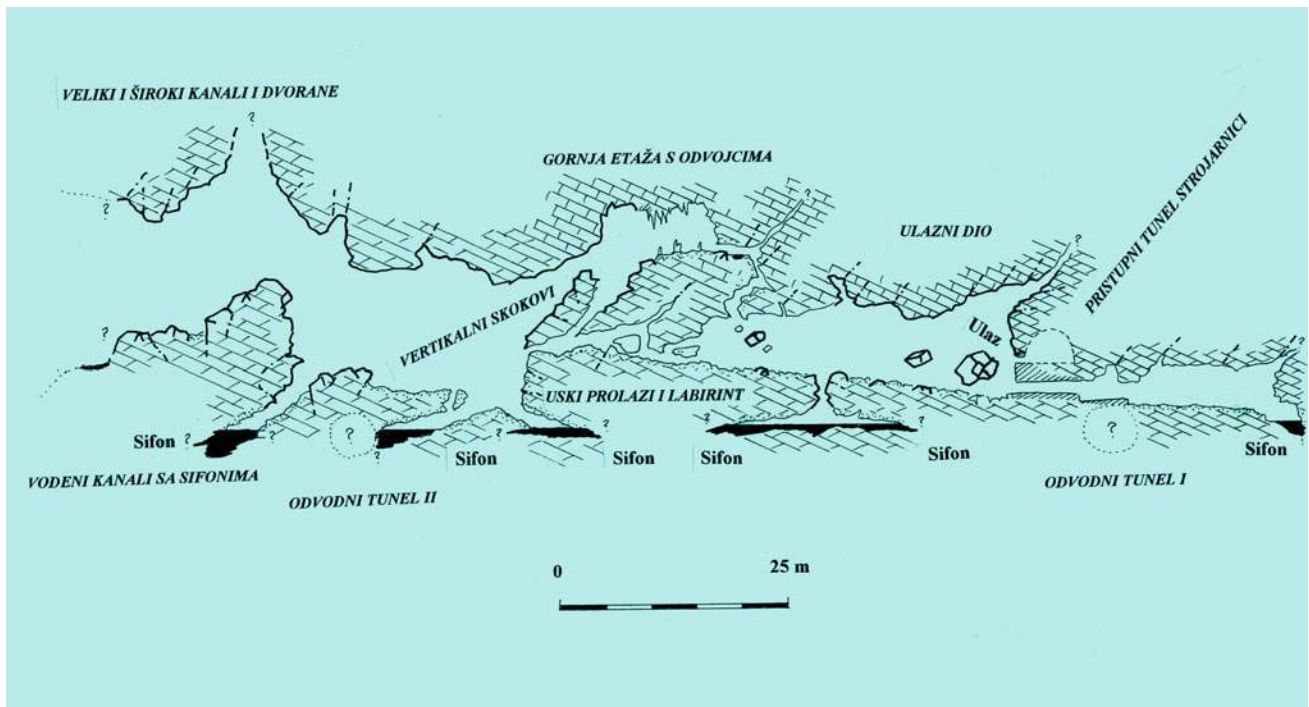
Caverns in the drainage tunnels of HPP Dubrovnik (profile)
